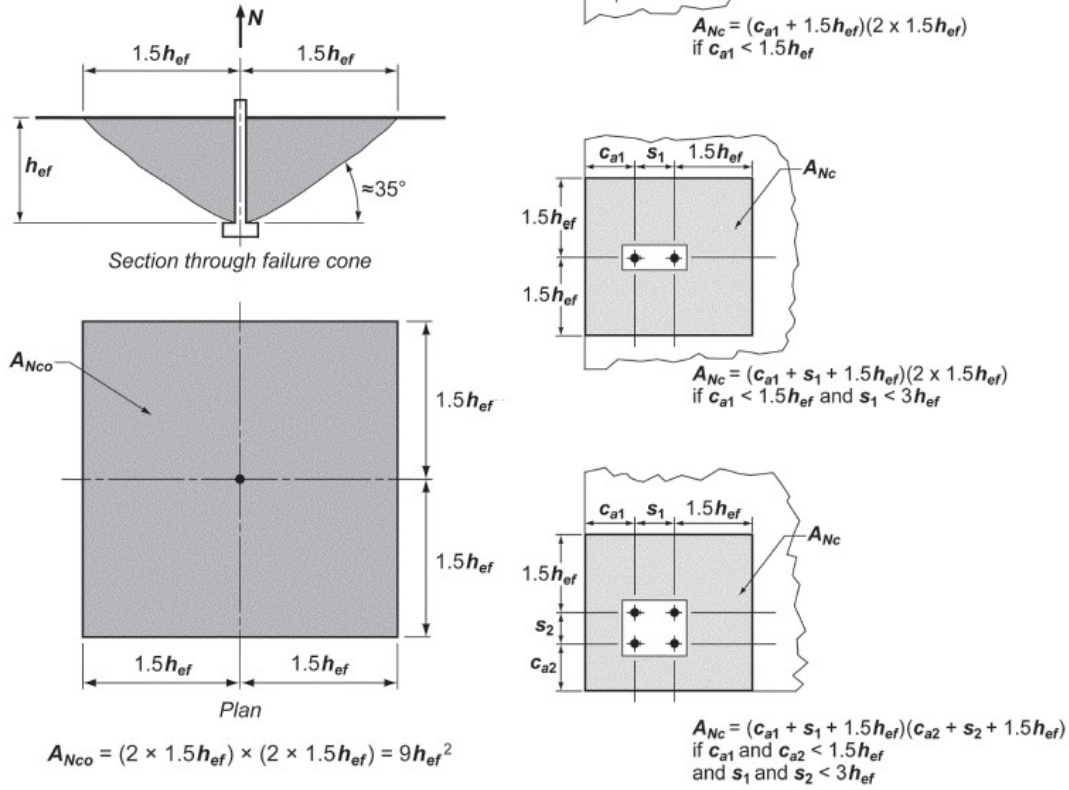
Examples of various concrete breakout failure projected area for single and group anchors (ACI CODE-318, 2019)
